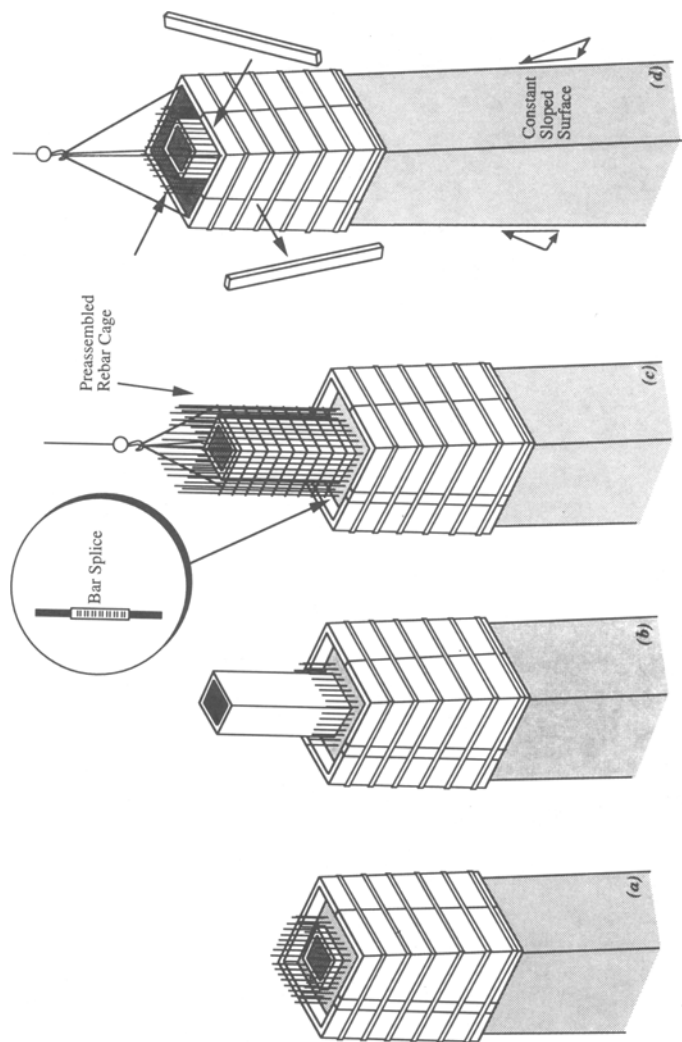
Concrete Forming Sequence for Bridge-Tower Construction: (a) End of Previous Pour; (b) Place Inside Forms; (c) Set Rebar Cage; (d) Remove Vertical Strips and Jump Forms
